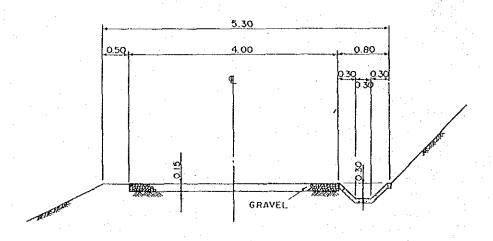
Plan of Road Rehabilitation and Construction
